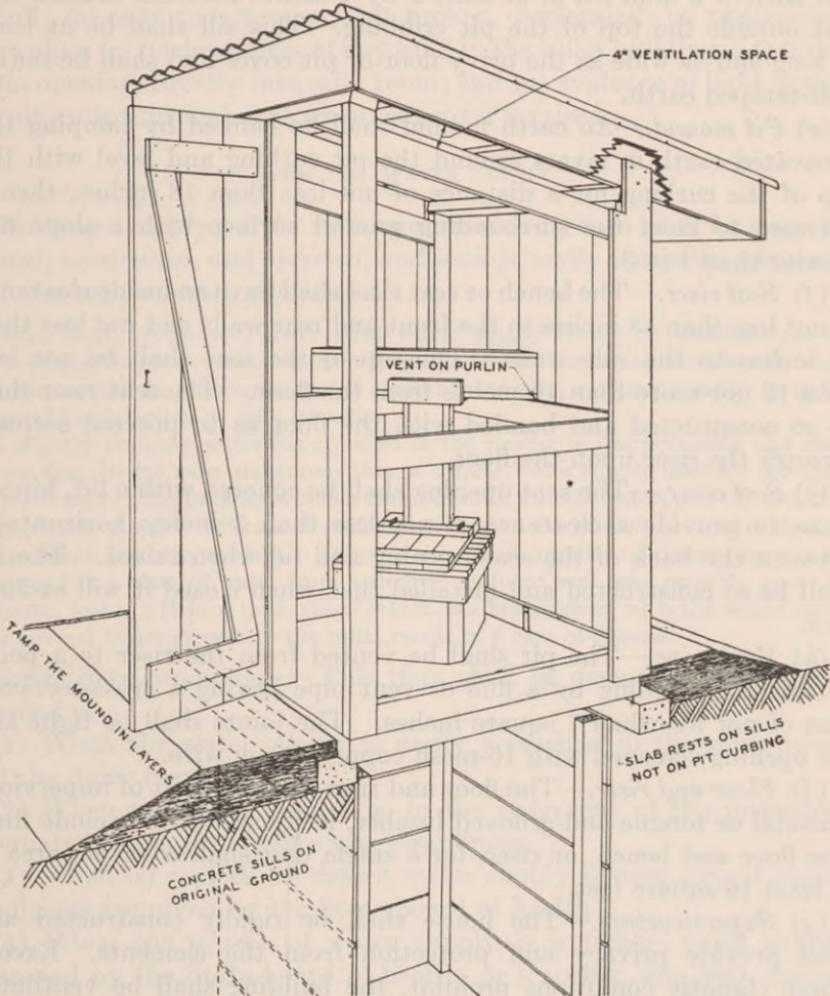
Suggested concrete-floor concrete riser pit privy. (Revised Type No. IV of Supplement No. 108, P. H. Reports.)
